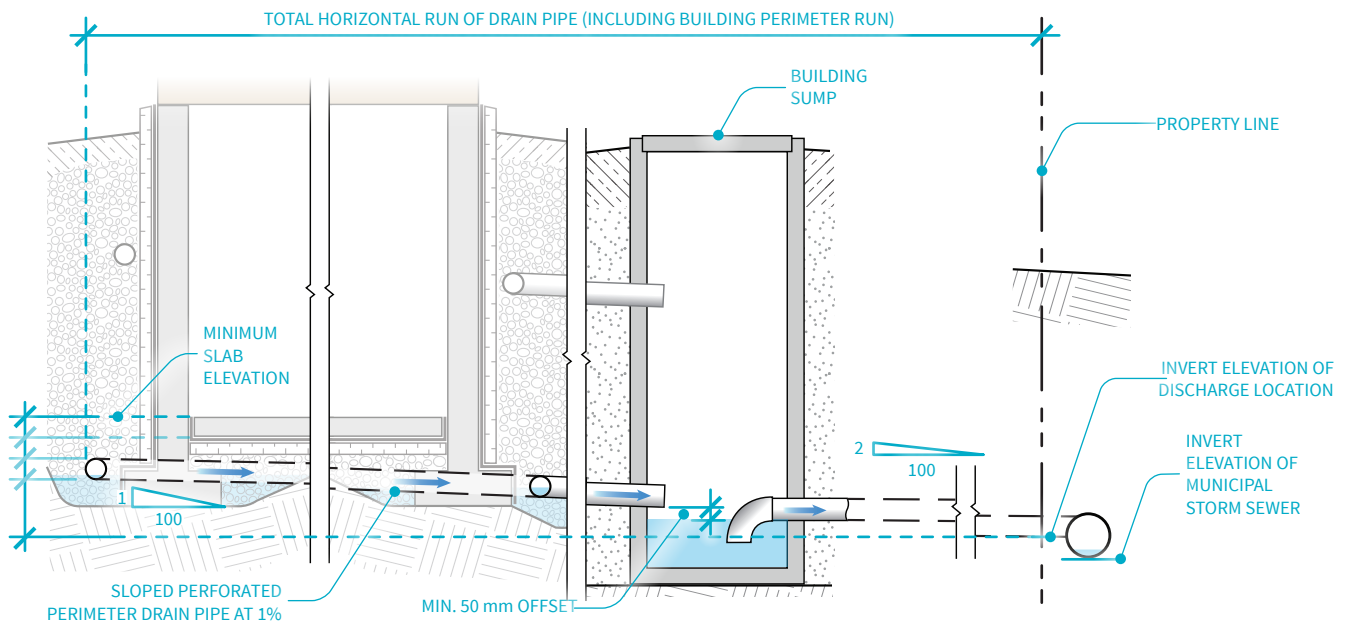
Typical section of gravity-drained foundation drainage system.
